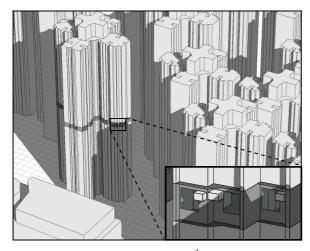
Model of flats on the 20<sup>th</sup> floor (highlighted in dark grey half way through the building)
